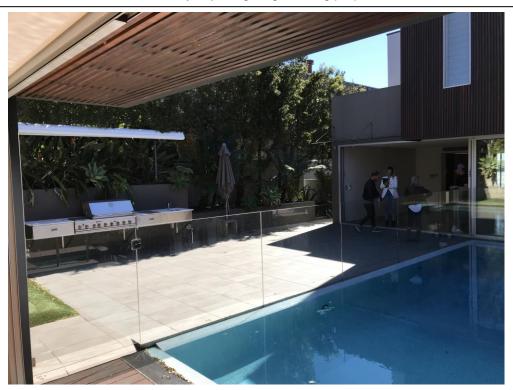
View North-West showing rear of dwelling when viewed from studio. Proposed pergola with green roof will run from the rear of the dwelling across the paved area providing much needed protection from the elements and a place to dine/entertain in all weather. The green roof will assist to soften the structure which will not be seen from any neighbouring dwelling.
